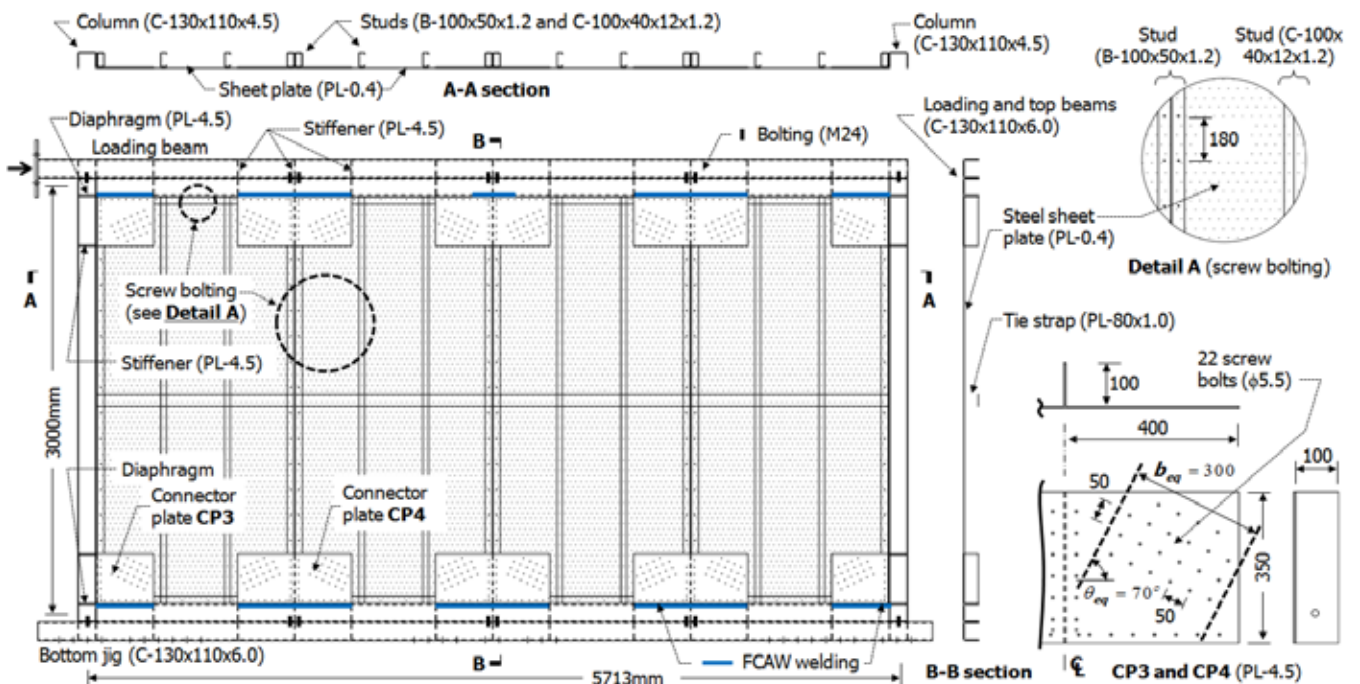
Configurations and details of modular building unit SSP using sheeted stud panel (mm)
